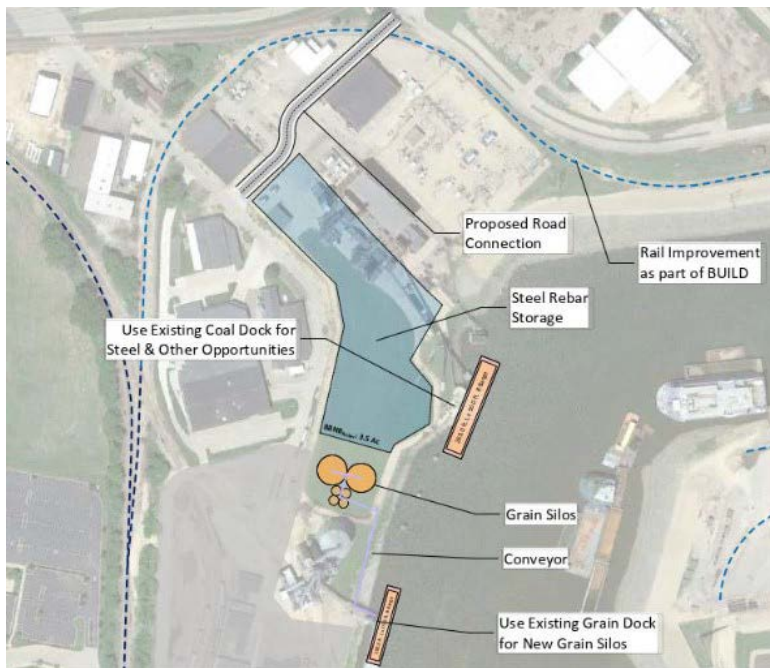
Proposed Long-Term Development Plan, Gavilon (Seventh Street)
